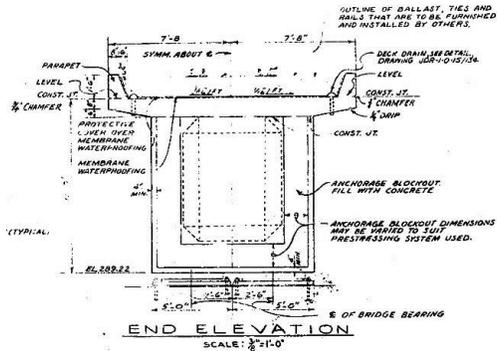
Pre-stressed concrete box girder bridge, US Army Corps of Engineers for SP&S (1962).
